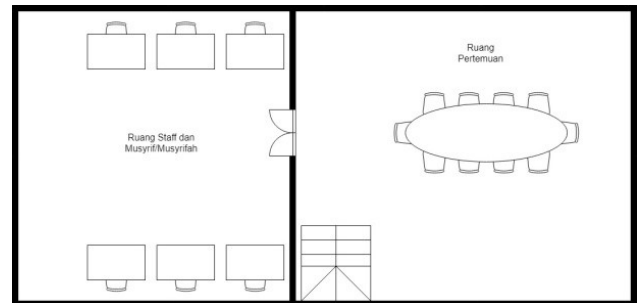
Floor plan of the second floor of the ma'had headquarters
